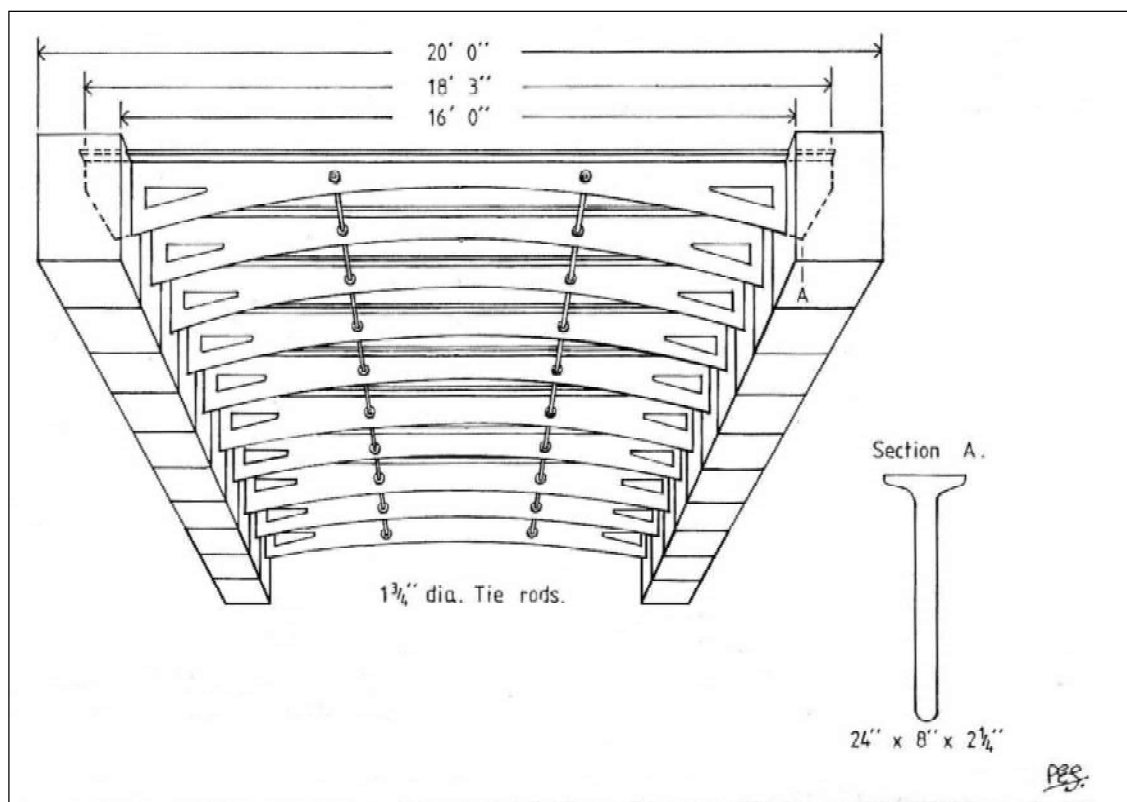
The bridge was 25 feet wide and the cast-iron girders were carried in bearing stones 2 feet 6 inches long. Intermediate joists fabricated from rolled steel were added in 1942, when the tie rods were discarded. Its decking comprised stone slabs stated to have been approximately 6 inches thick; assuming they were dressed sandstone, an area of 25 feet by 18 feet by 0.5 feet would have weighed 32,625 lbs (14.6 tons).
